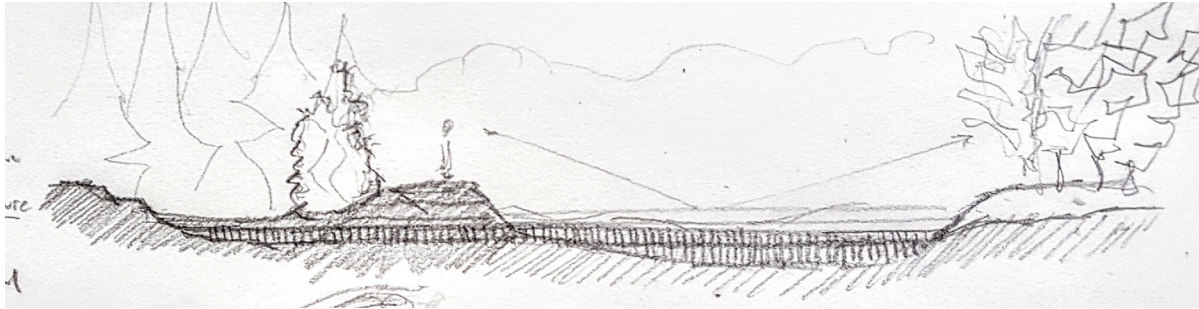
(Above) Shimmering Flats Topography Concept Plan Sketch
